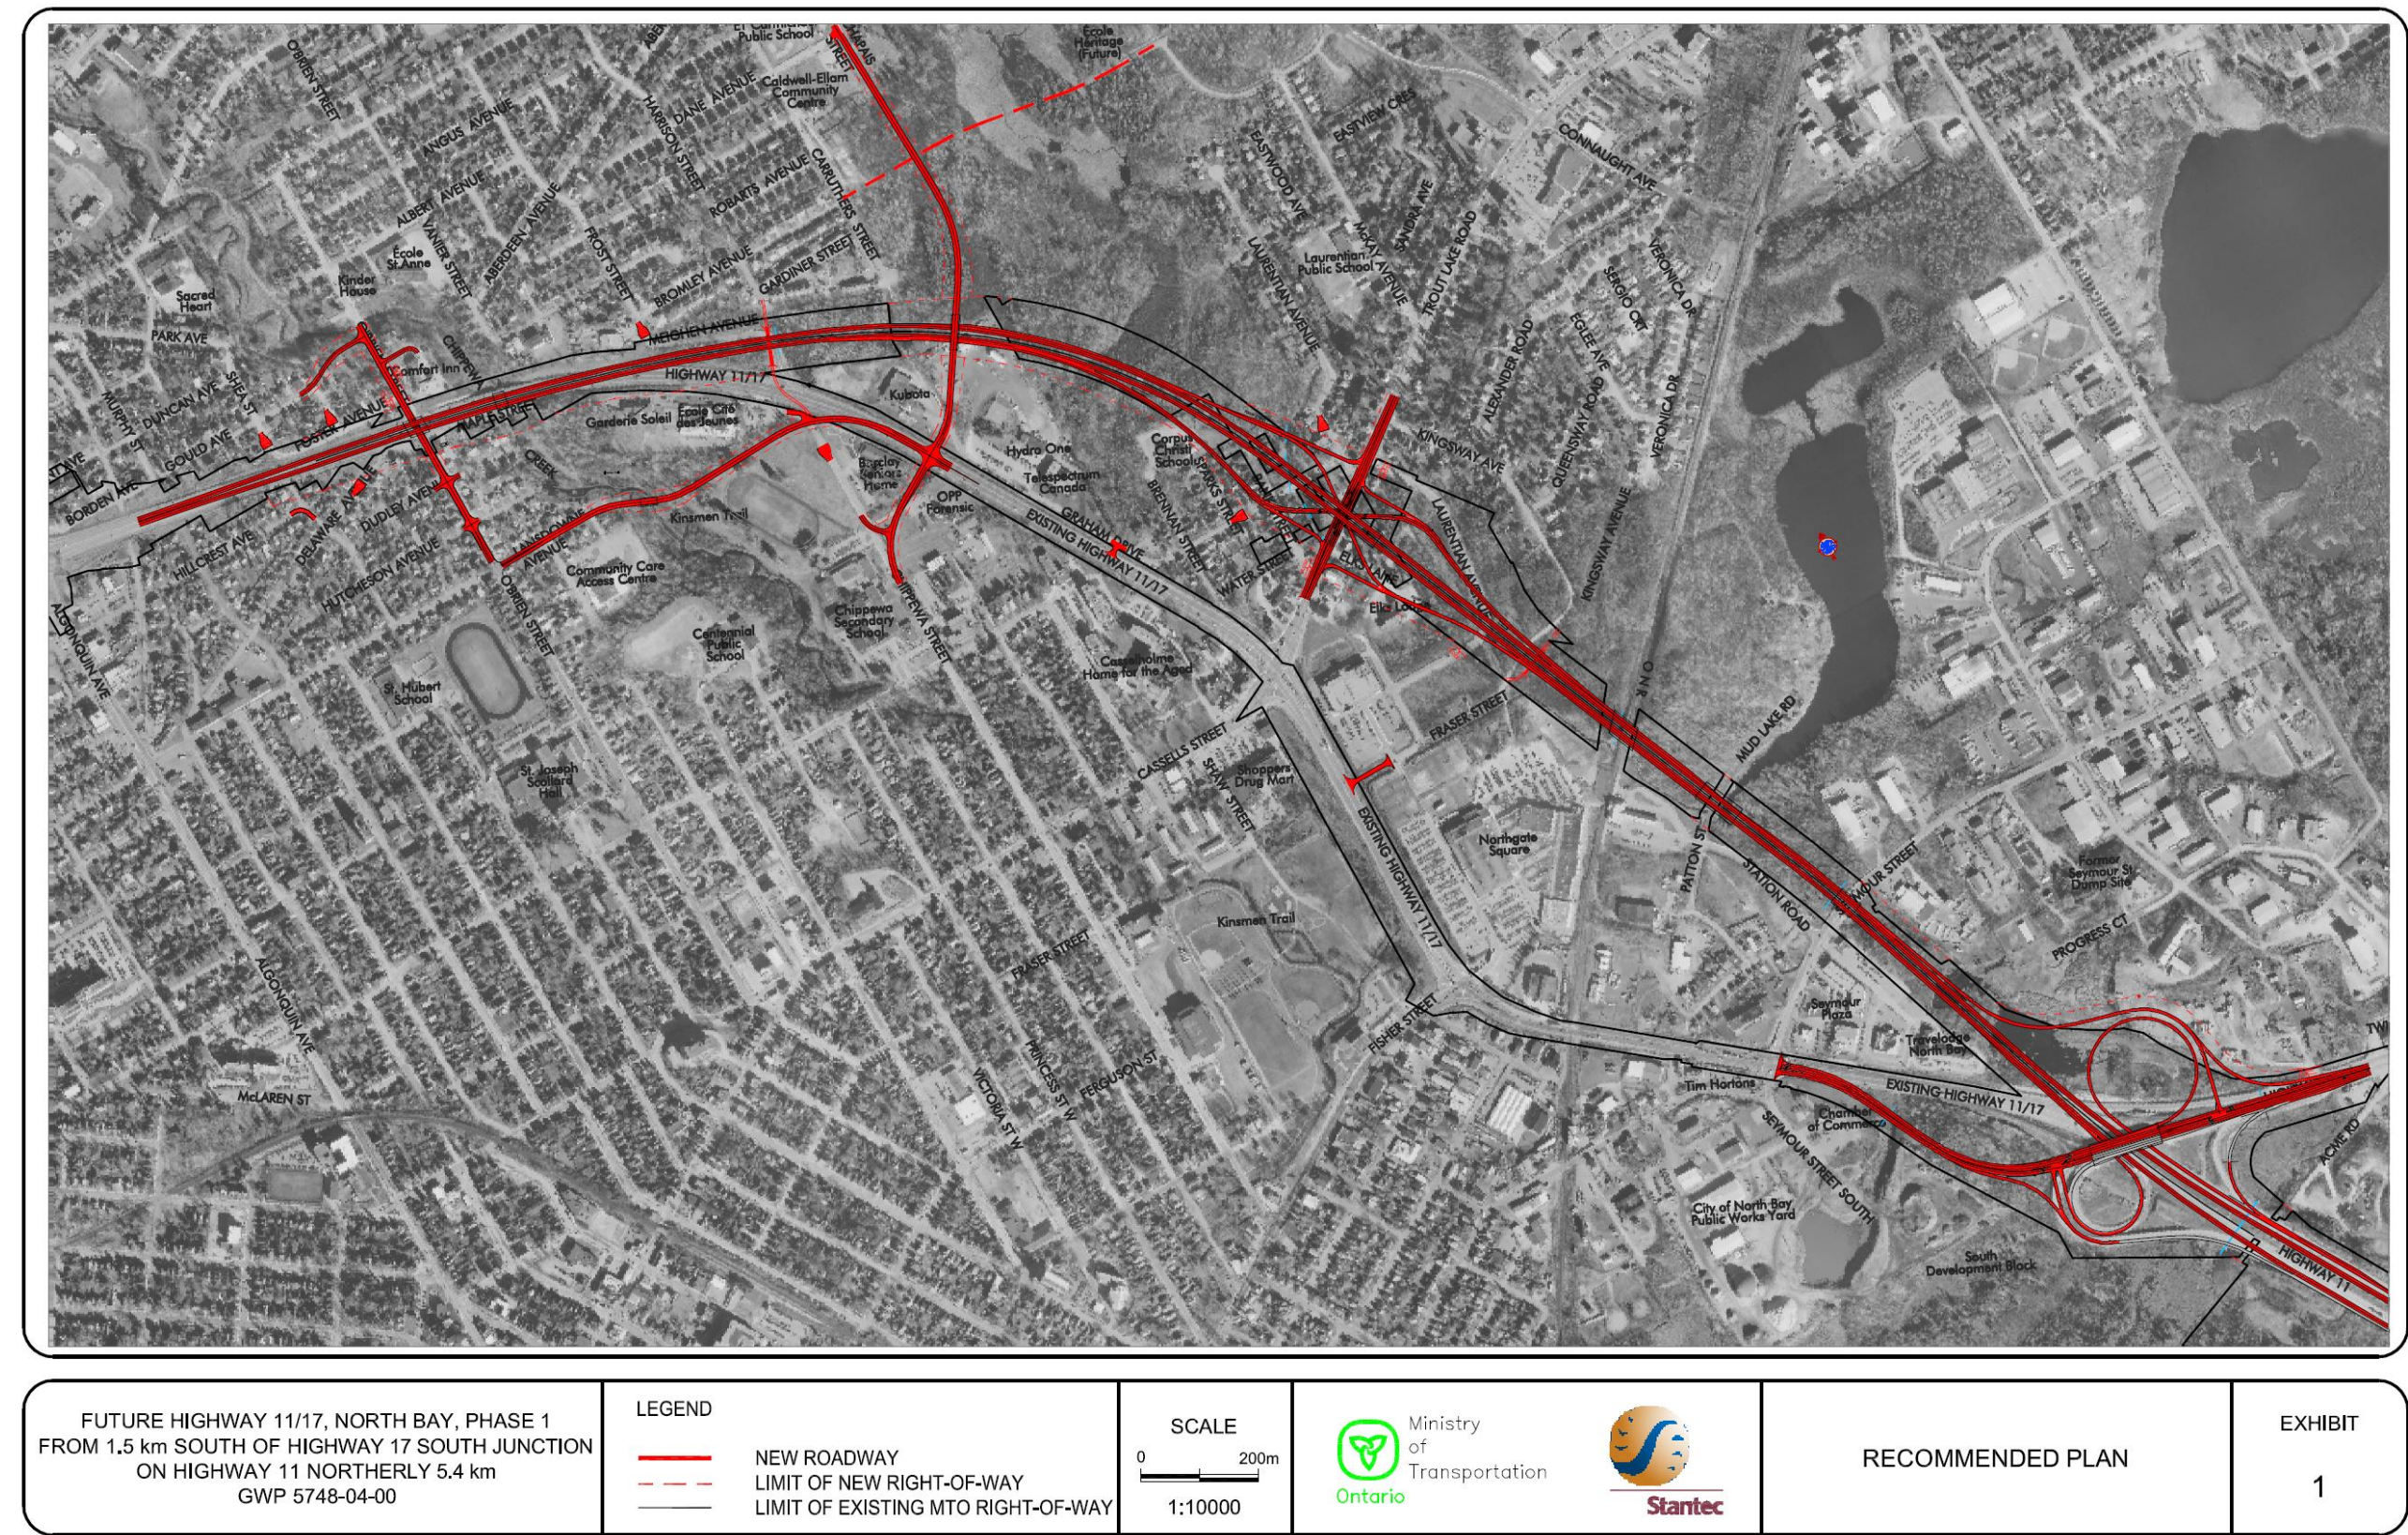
Future North Bay Highway 11/17 Bypass - Recommended Plan
